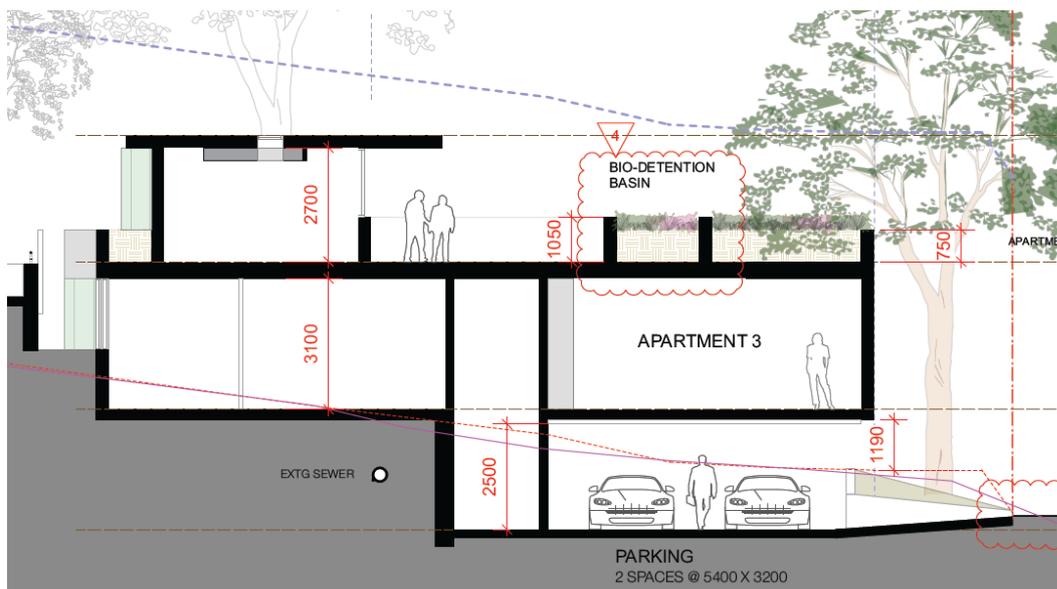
Proposed section through eastern building showing the height of the rear car parking area above existing ground level
